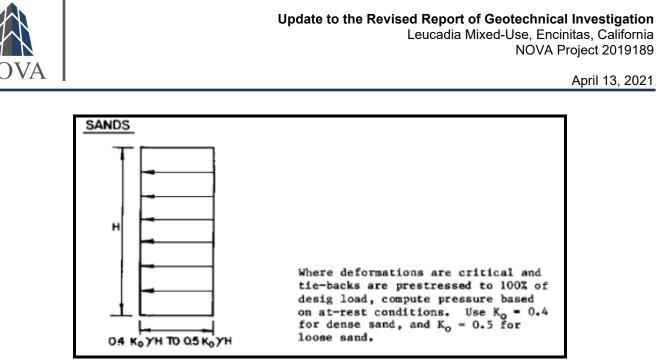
'At Rest' Wall Pressure Distribution in Sands (source: NAVFAC 1986)
